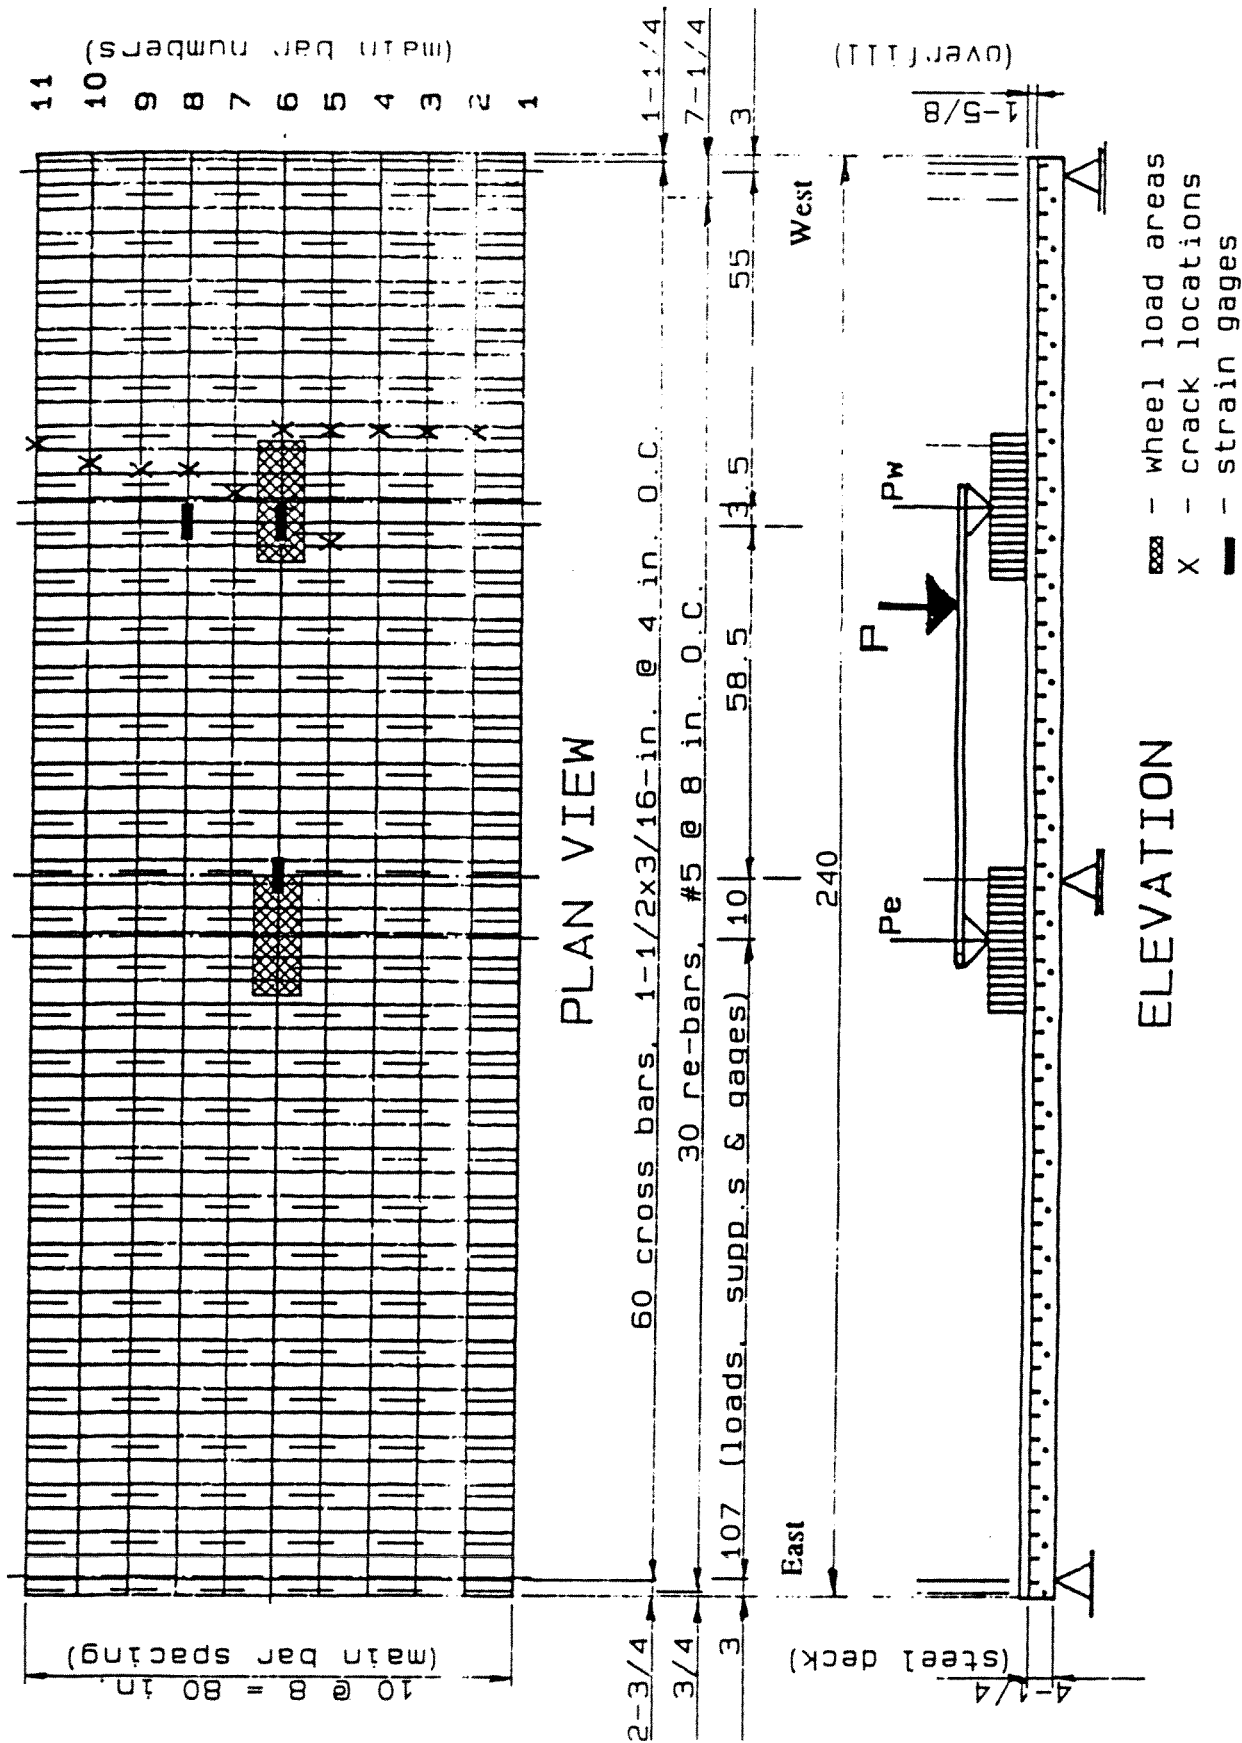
Fatigue Test #3 Specimen - General Arrangement, Including Gage And Crack Locations
